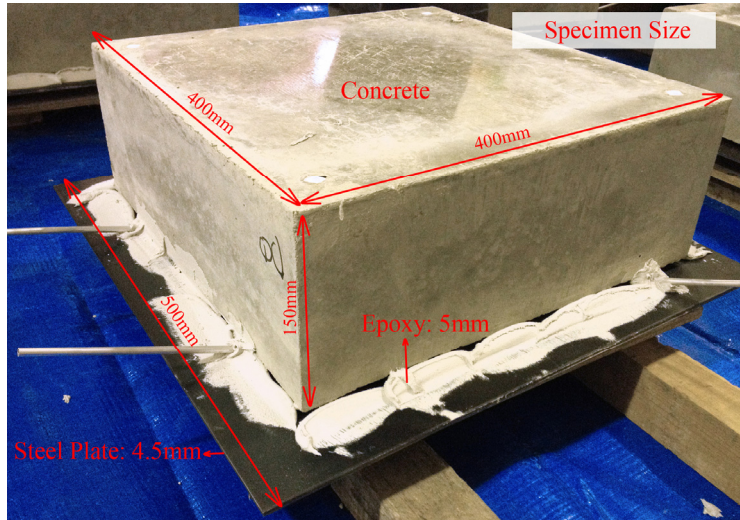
A Steel-Epoxy-Concrete specimen (epoxy injection).
